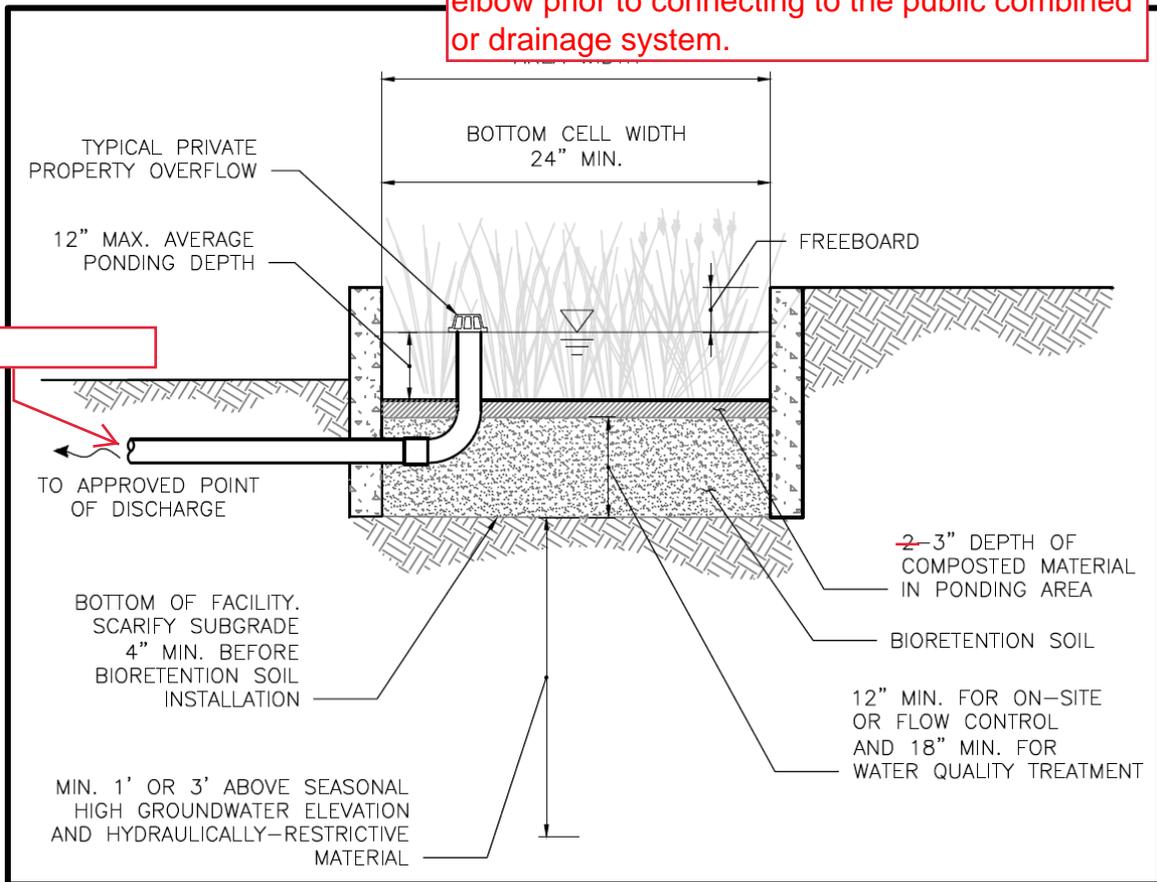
Infiltrating Bioretention Facility with Vertical Sides (without Underdrain).
